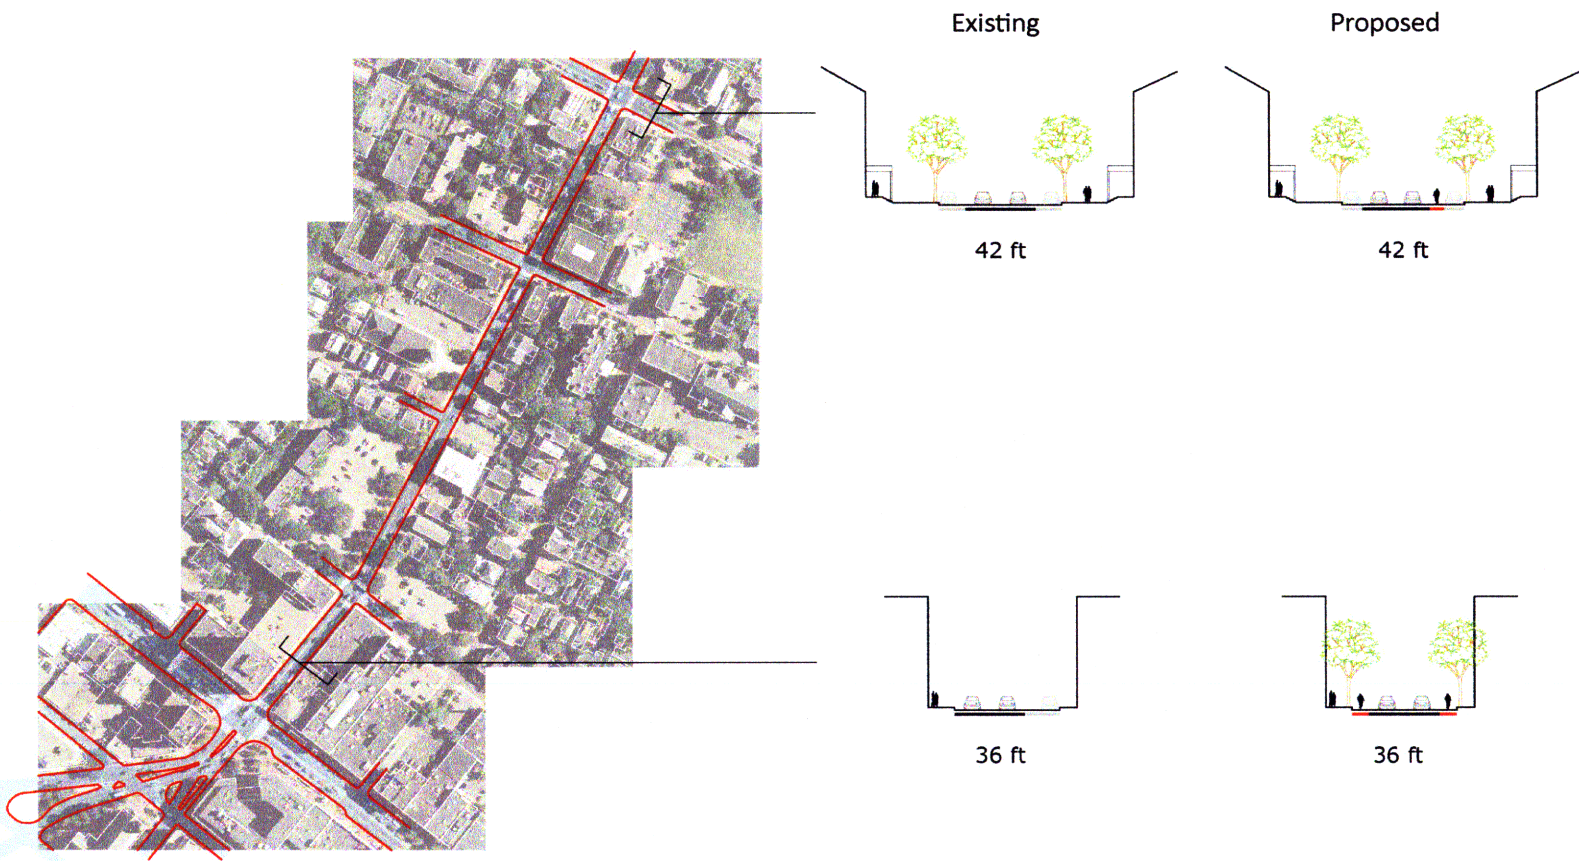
Existing and improved street sections for Prospect Street and Cambridge Street.
